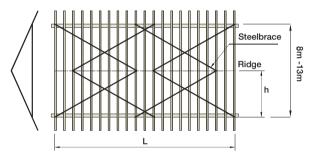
Steelbrace layout for short roof, spans 8m to 13m
